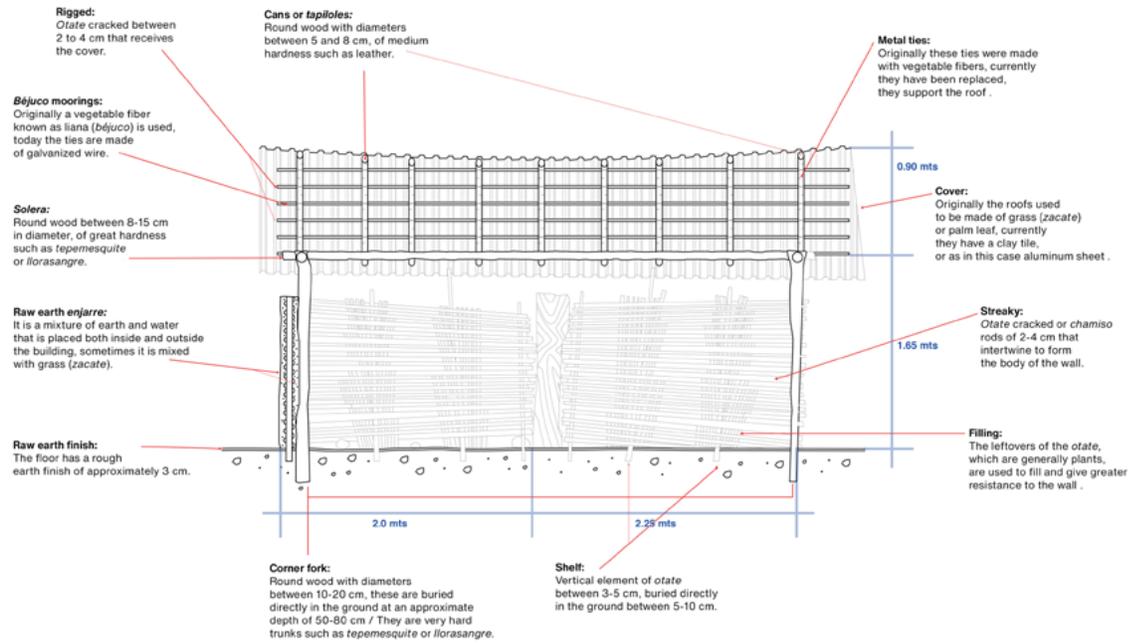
Cross-section of the facade of a *pajarete* house in which the construction system can be seen in detail (Drawing: Antonio Flores, 2017).
